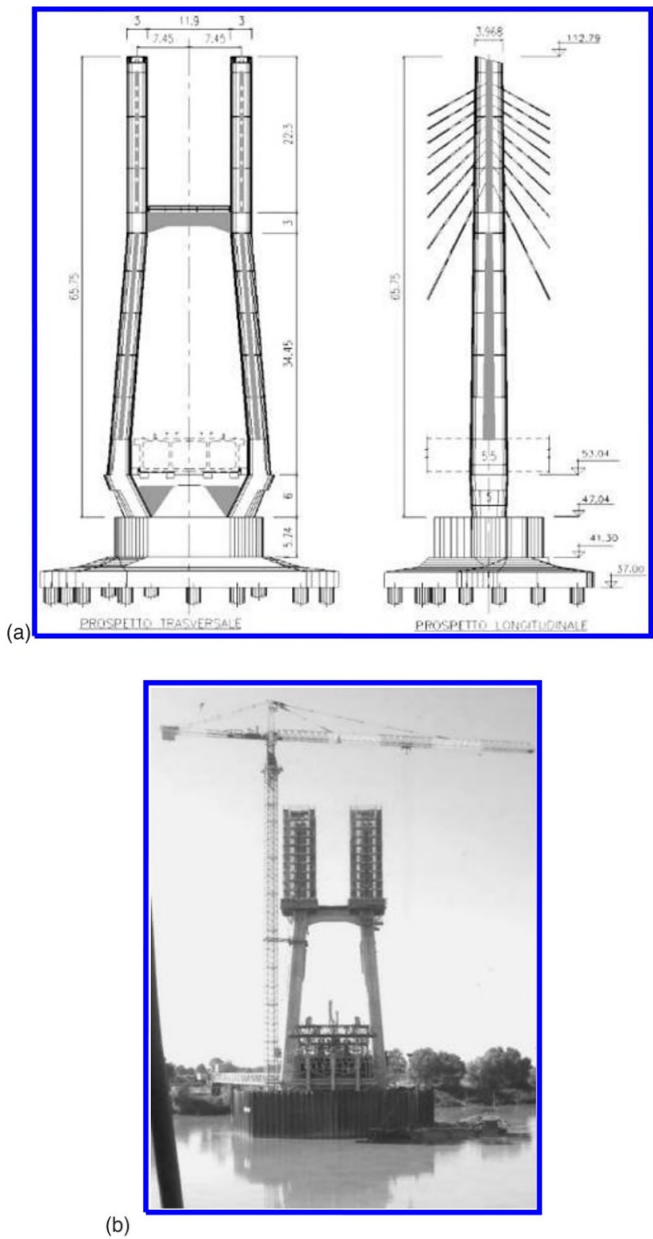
(a–b). Front and side views of the tower and the same element under construction.
